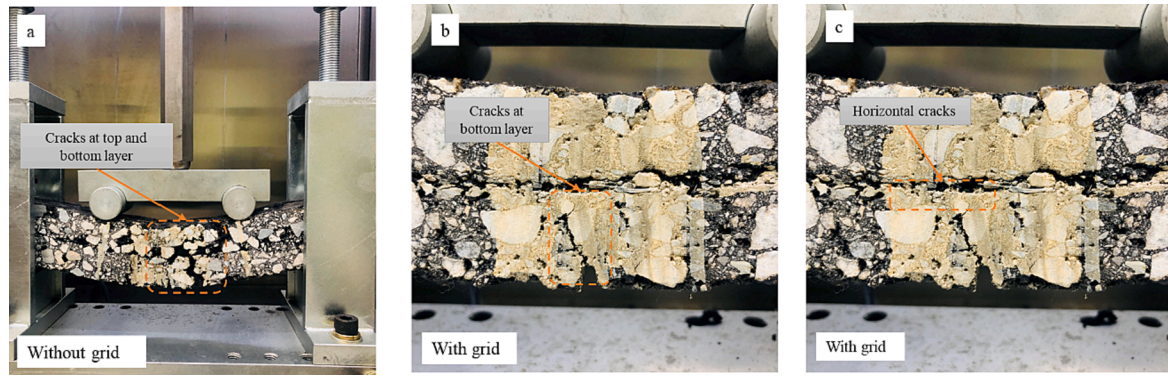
Cracks in beam sample without grid reinforcement (a) and with grid reinforcement (b, c).
